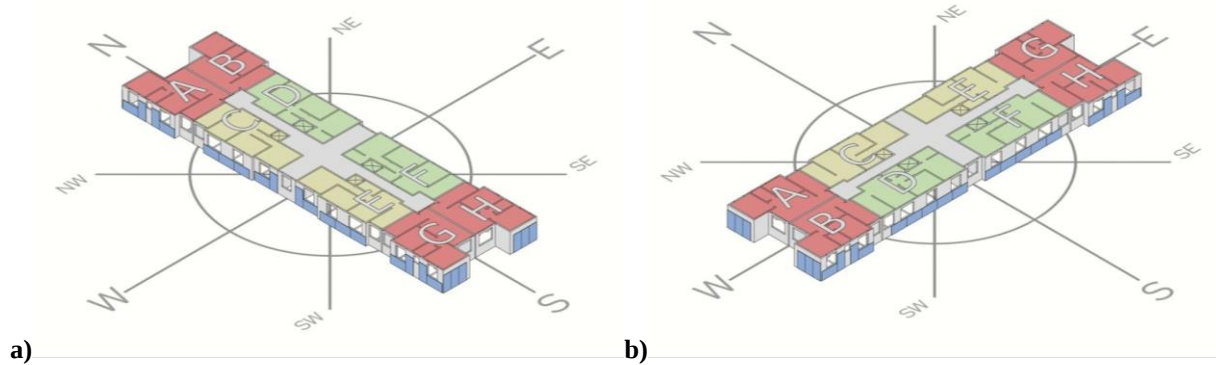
Building orientation (a) North-South (a) and (b) East-West, adapted from Triana et al. (2015). Corner apartments are shown in red, center apartment facing one direction in yellow, and center apartments facing the opposite direction in green. Photovoltaic (PV) modules attached to the façades are represented in blue.
